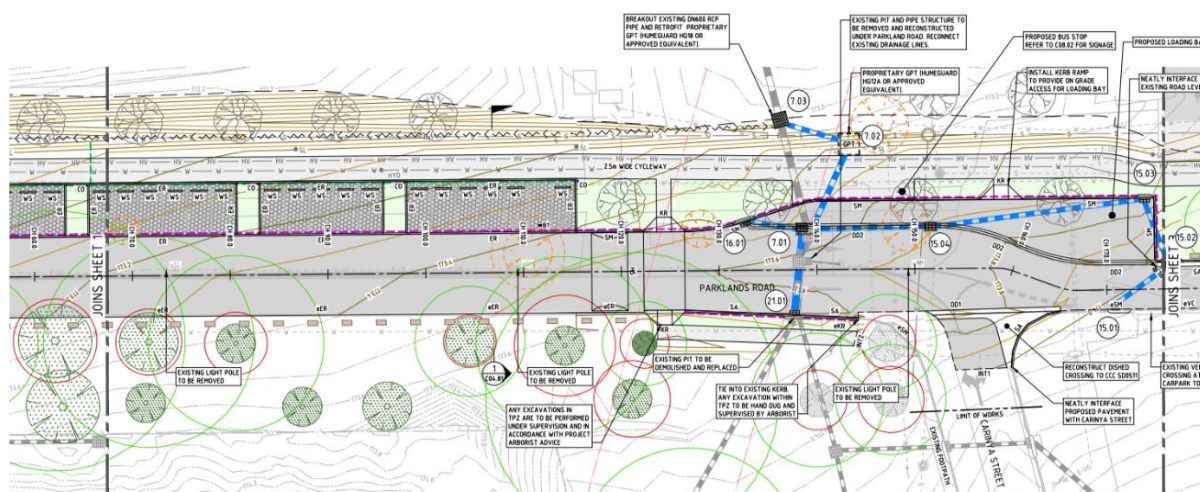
Mid-section Parklands Road between Waterfall café and upper dam (Source: Northrop)
